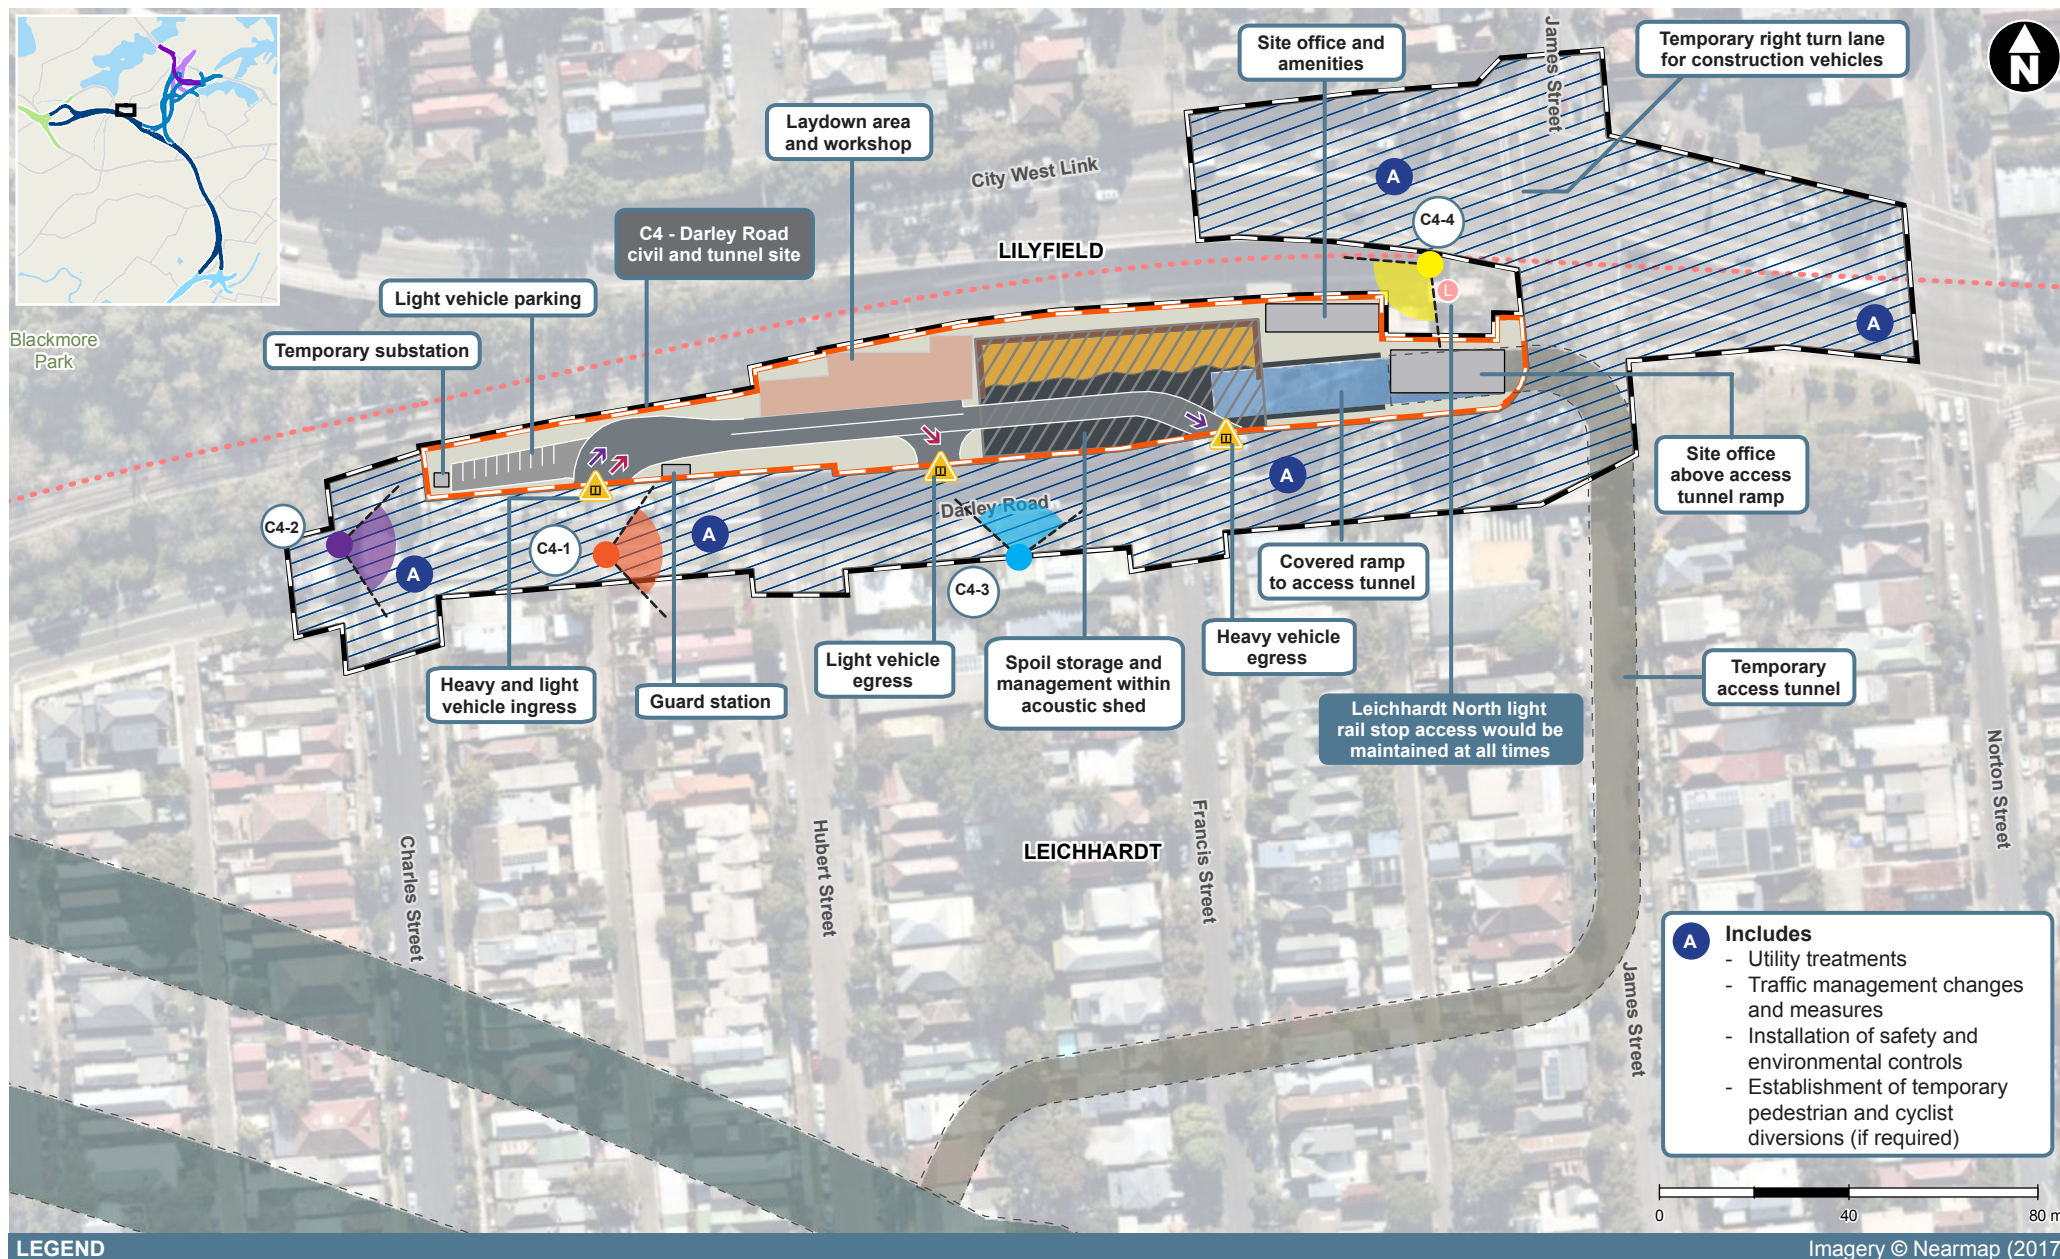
Darley Road civil and tunnel site (C4) representative receiver locations
